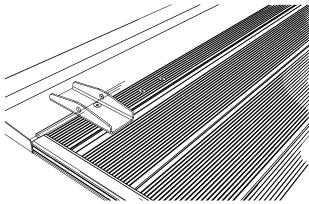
Tighten the bolts and hang the platform onto the floor extension by means of the assembly supports.
